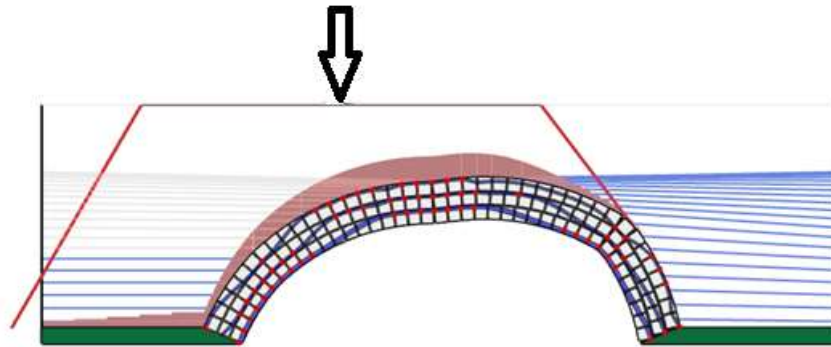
Collapse mechanism for arch loaded by 3 m square footing, column position at arch left quarter-span.
